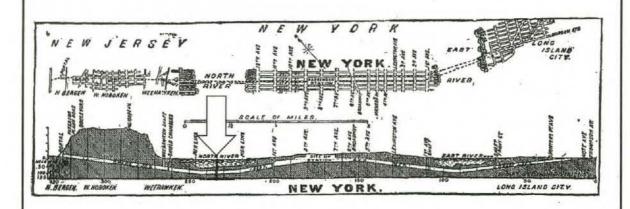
Diagram of Pennsylvania Tunnel System Between New Jersey and Long Island - Arrow Shows Where Connection Will be Made in North River (Penny's North River Tunnel a Marvel of Skill - New York Times, Sept. 9 1906.)
